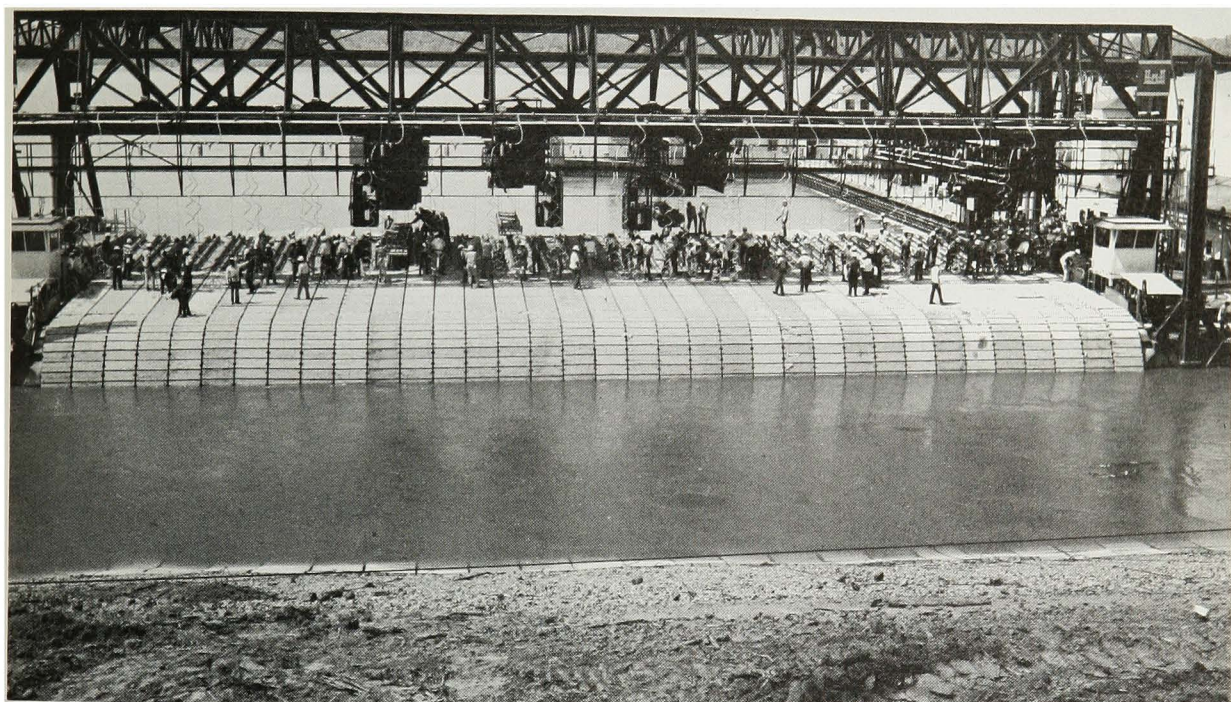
Launching articulated concrete revetment from mattress sinking plant
